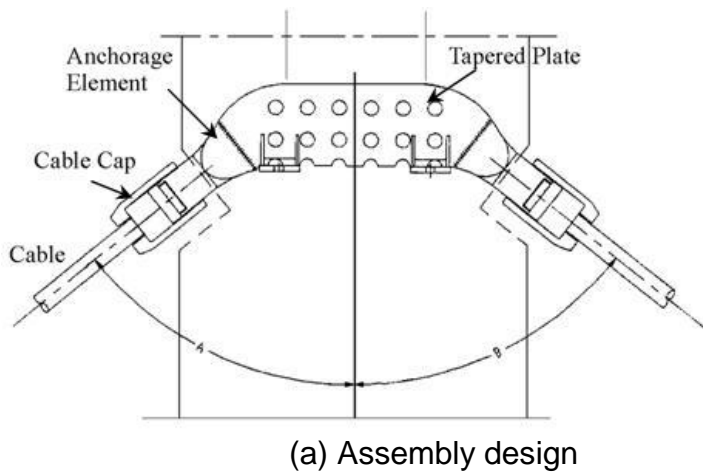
Upper anchorage assembly used for the cable system of the Río Papaloapan Bridge
